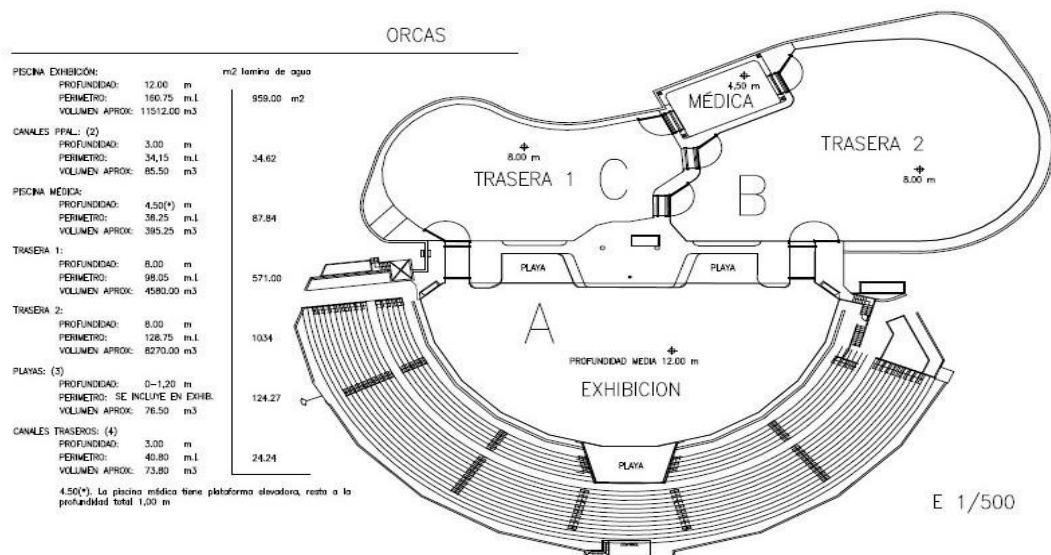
Plan of Loro Parque orca facilities with tank dimensions
